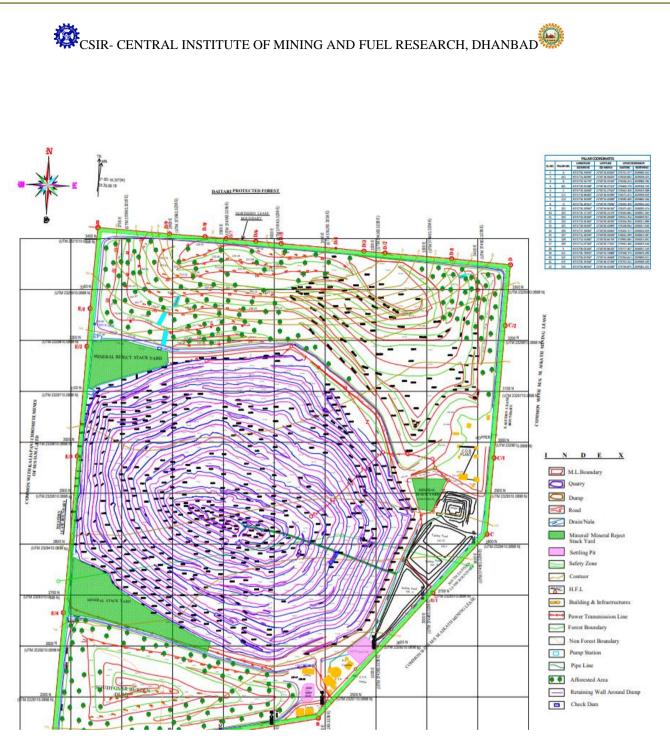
Surface Plan of pit and dump of Ostapal Pit
